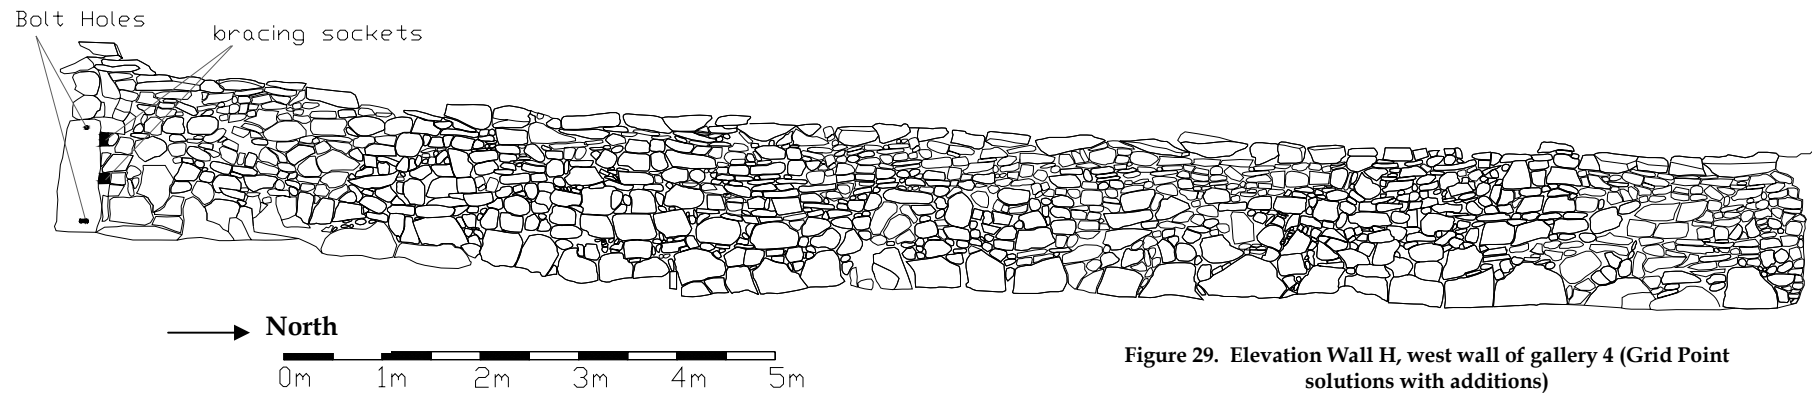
Elevation Wall H, west wall of gallery 4 (Grid Point solutions with additions)
